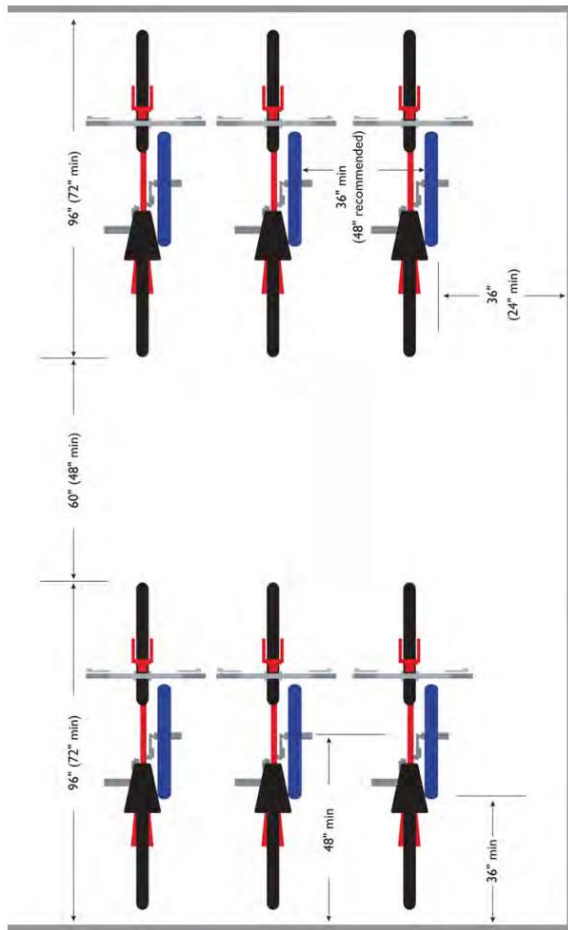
Typical Layout of a Bike Parking Area on Private Property (Source: APBP²)
